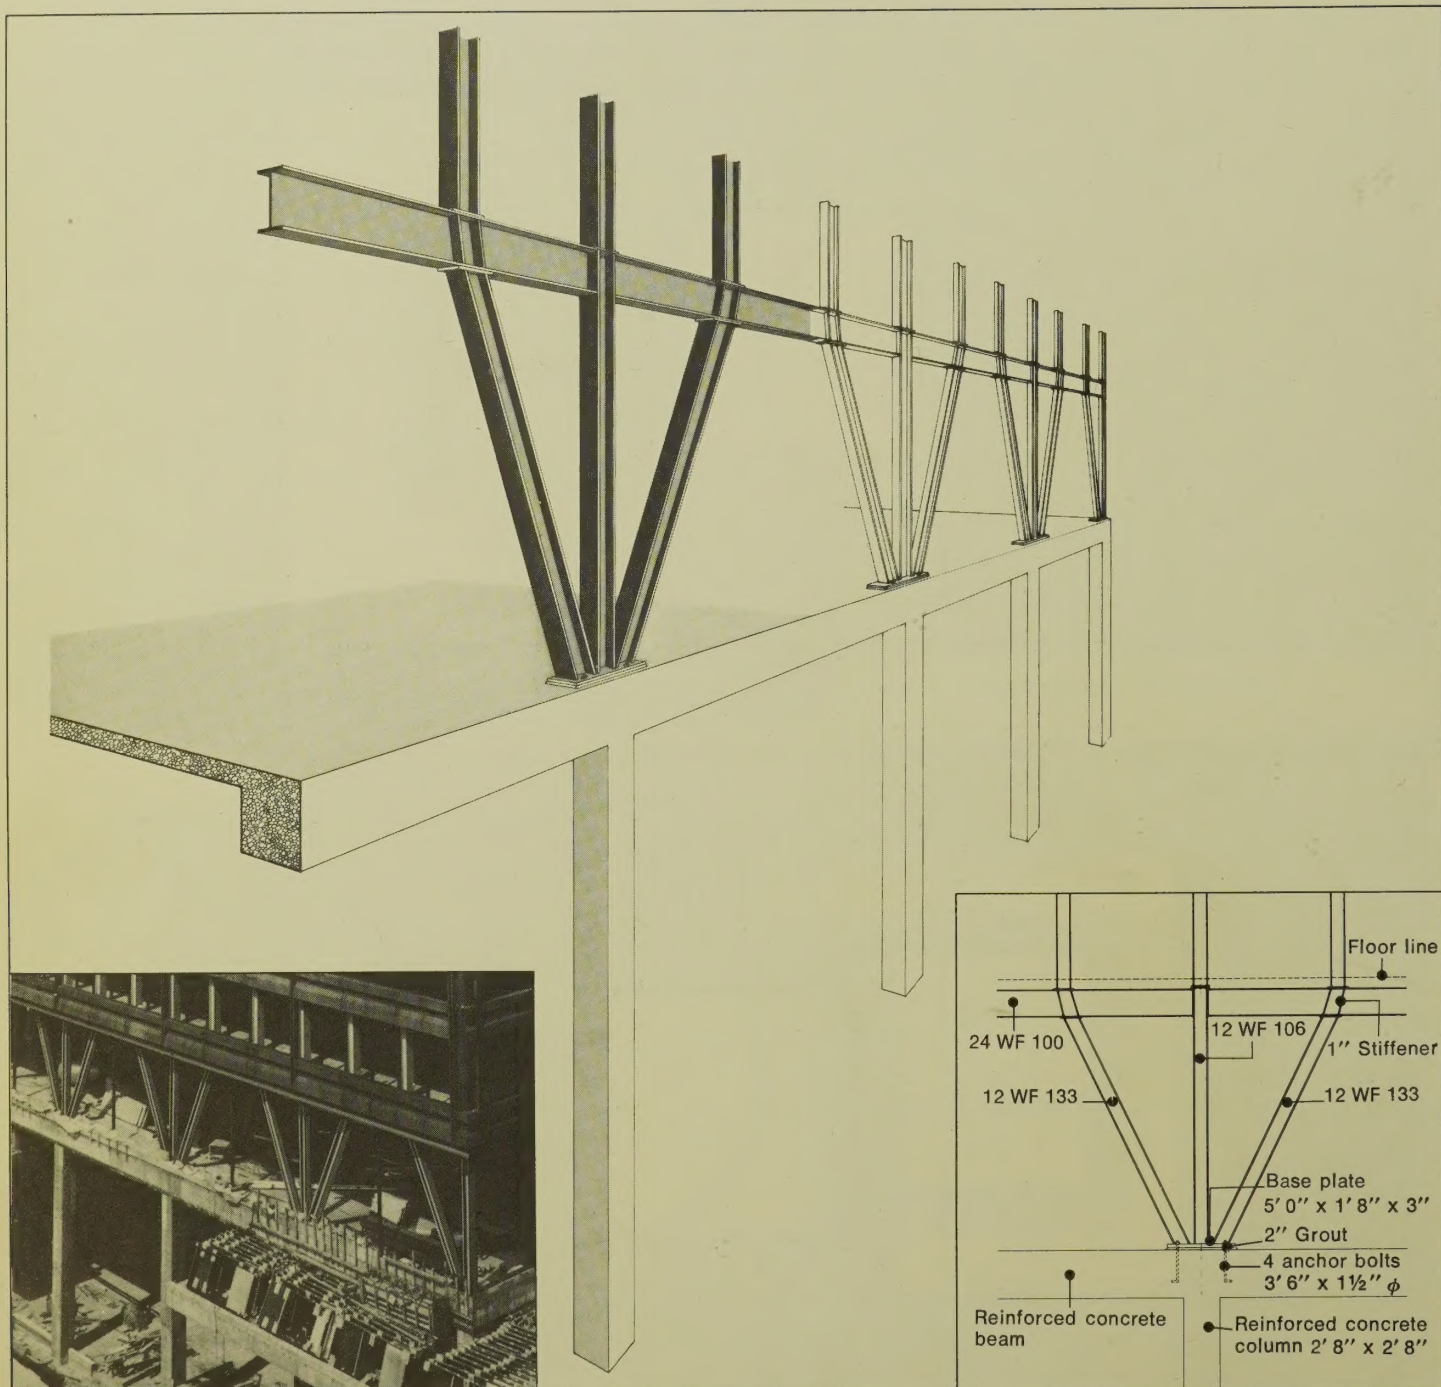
Transfer from concrete to steel columns (lower concrete columns at 30-foot centres, upper steel columns at 10-foot centres).
